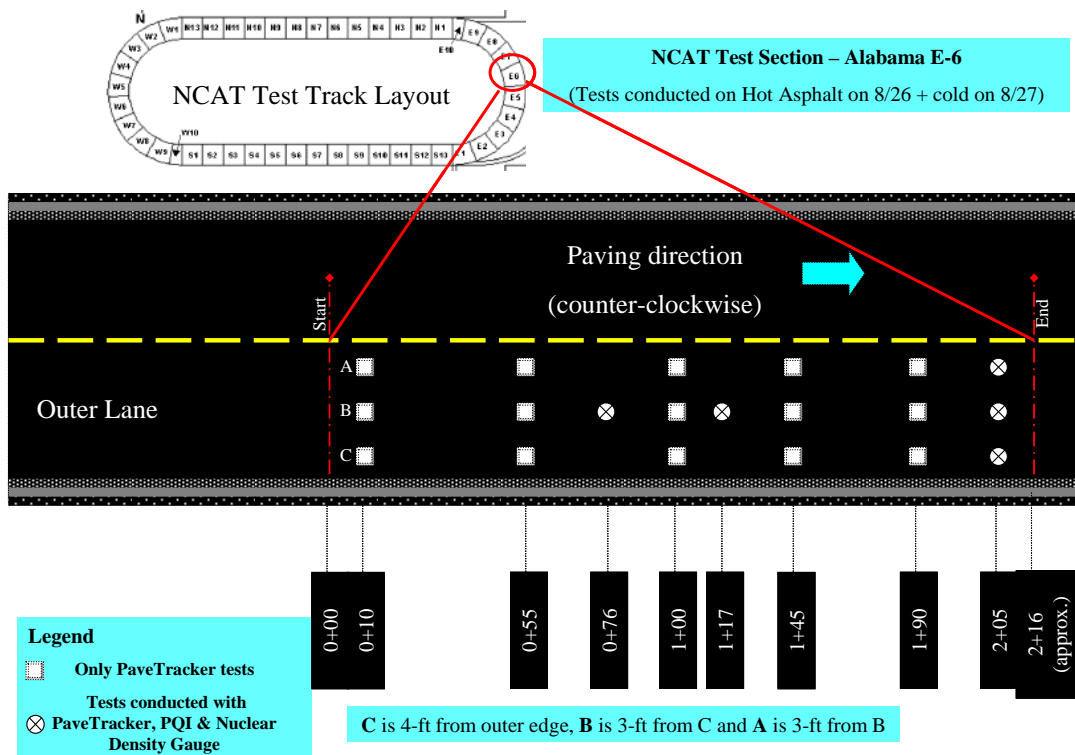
Test Point Layout Along the Alabama E-6 Test Section at NCAT (refer to Tables B.14 and B.15)
